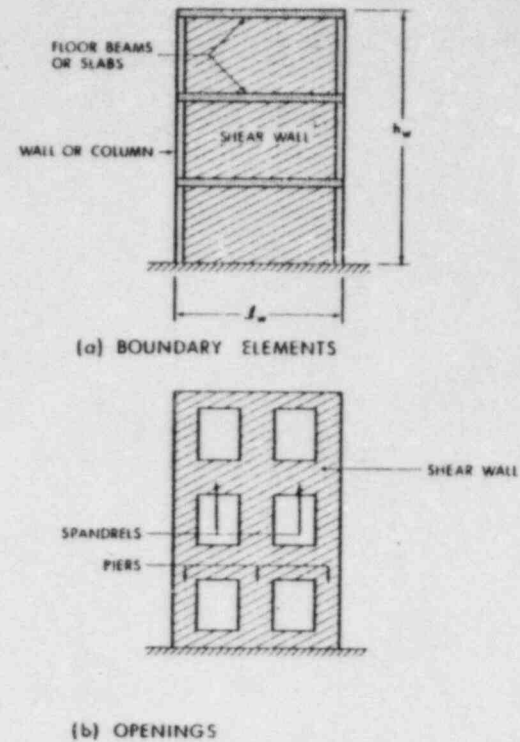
Elements Affecting Behavior of Shear Walls
